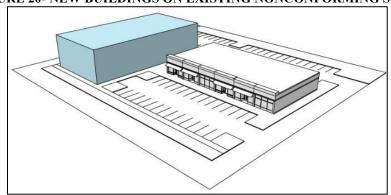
NEW BUILDINGS ON EXISTING NONCONFORMING SITES
